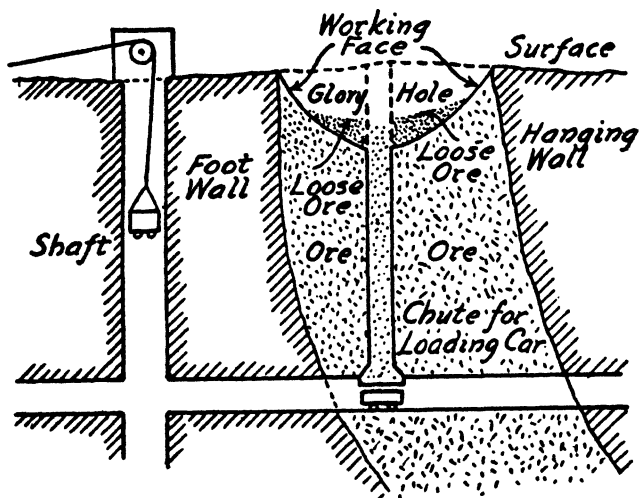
OPEN CUT MINING BY THE GLORY HOLE METHOD
